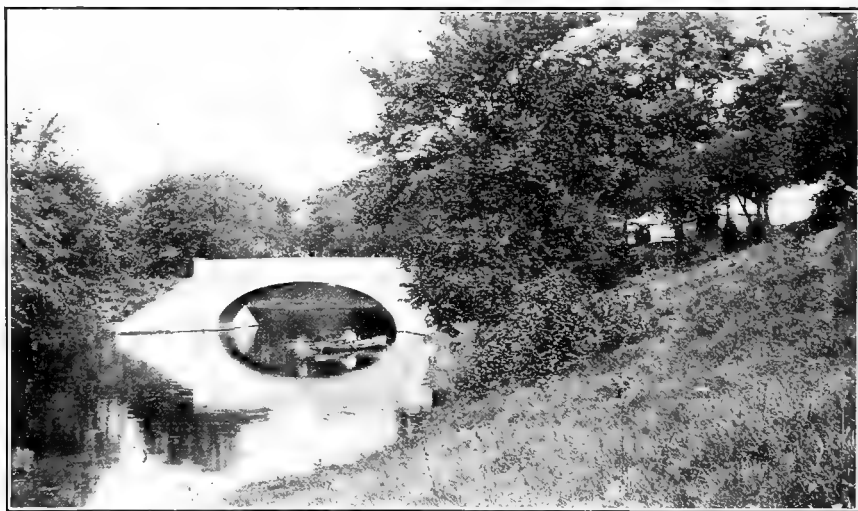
ARCH BRIDGE, DELLWOOD PARK, JOLIET, ILLINOIS.
